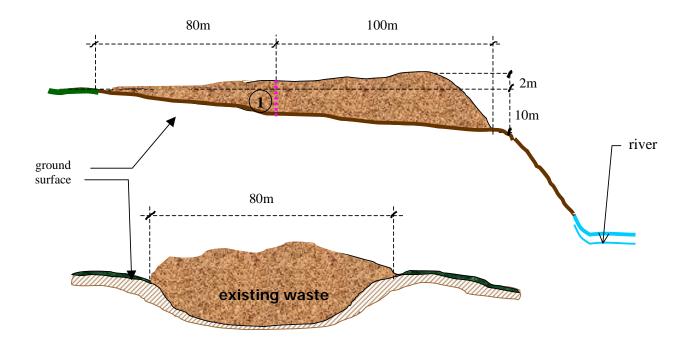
Approximate Profile and Cross-section of the Waste at the Site
